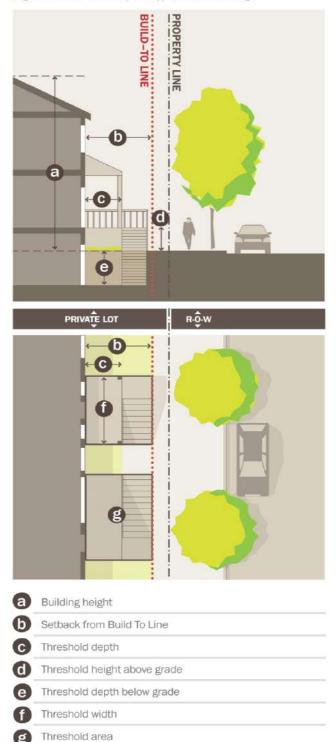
Porch/Stoop/Terrace Frontage
